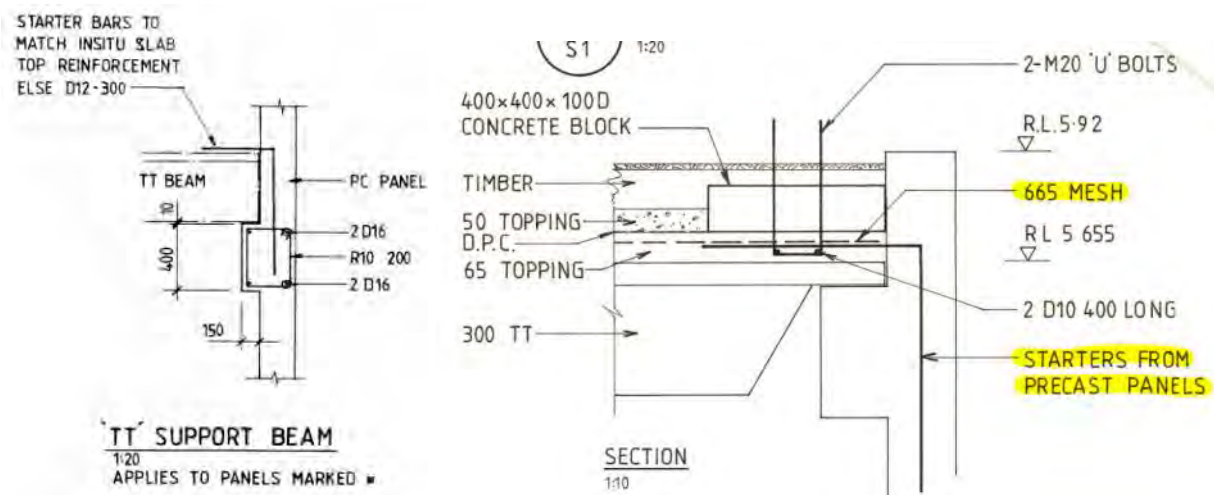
Extract from as-built drawing S8 and S16 - diaphragm to wall connection (note that the extract on the left shows a full web-height support and the extract on the right shows a flange hung double-tee, however this has not been observed on site)
